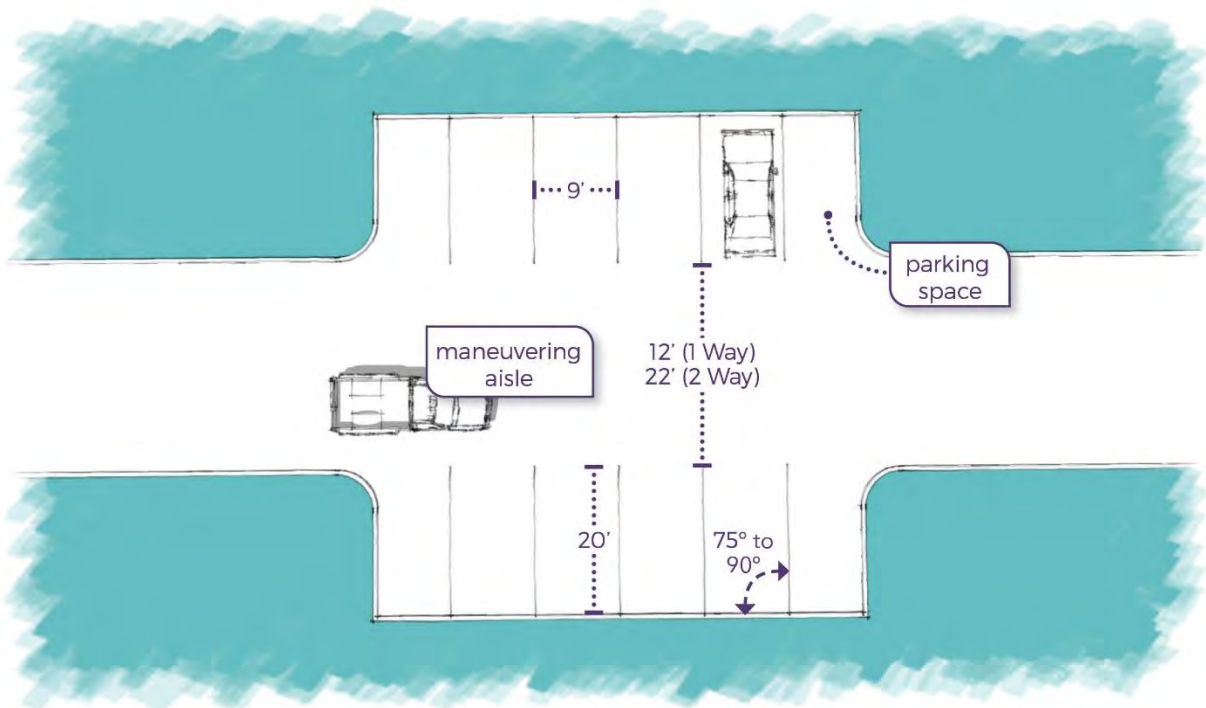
D. PARKING SPACE DIMENSIONS: 75-90 DEGREES
